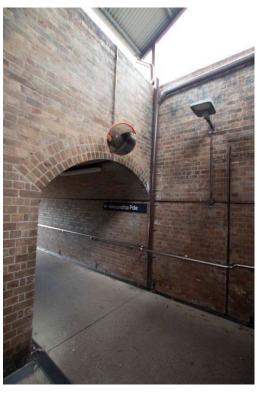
Arched entrance to the existing subway from Alexandria Parade showing the lightwell formed above it by the brick work (view to east)
